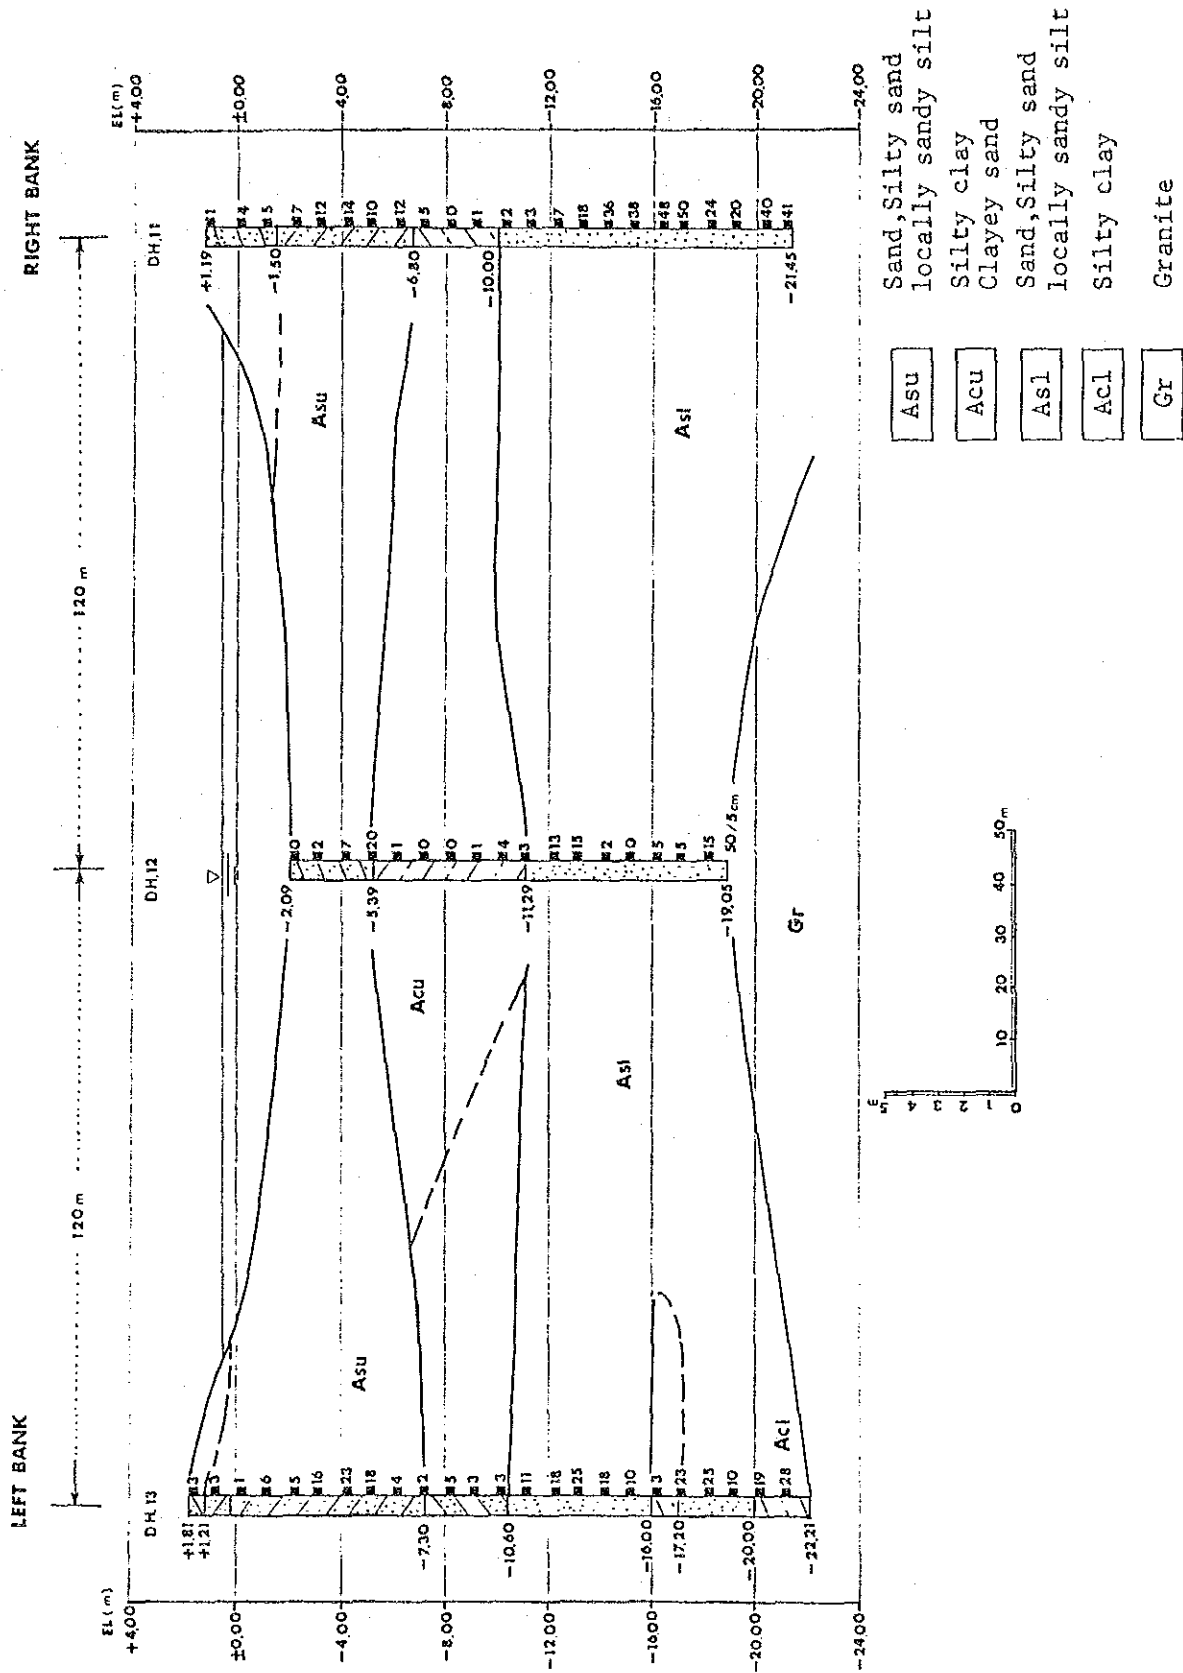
Geological Cross-Section (UTR Site - Sapi Yo Closure dam)
